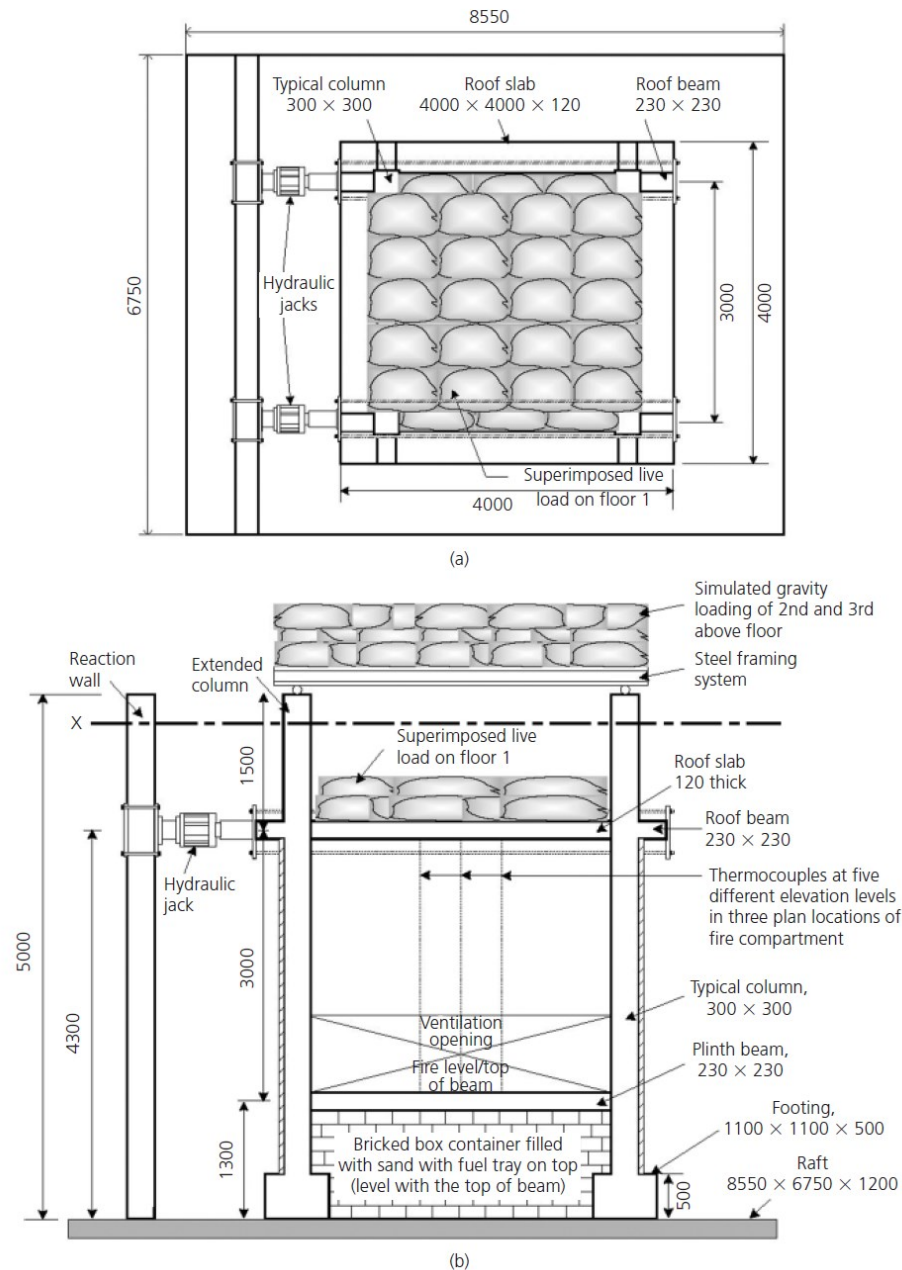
Schematic view of the test set-up: (a) plan of the test set-up; (b) elevation of the test set-up (all dimensions in mm)
